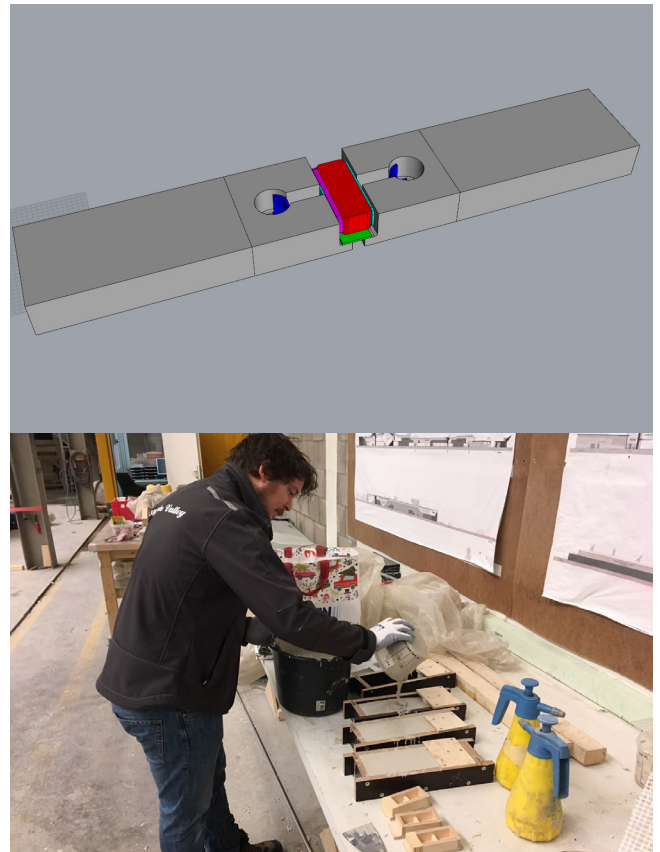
Pouring of the concrete (Peter Eigenraam, 2018)
